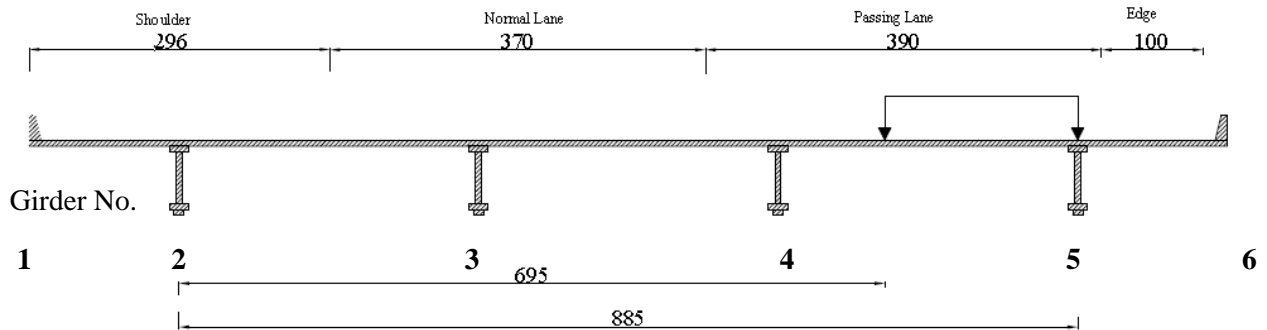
Transverse position of model truck on bridge for SECAN analysis of passing lane, (all dimensions are in mm)
